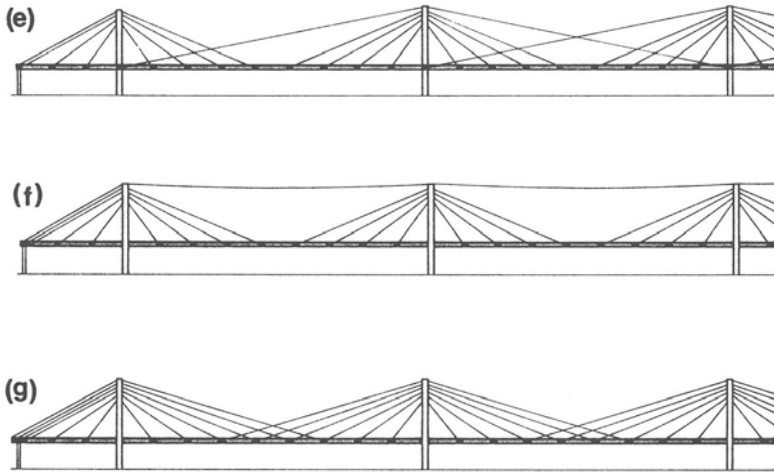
Modified cable systems to stabilize multispan cable stayed bridges.
